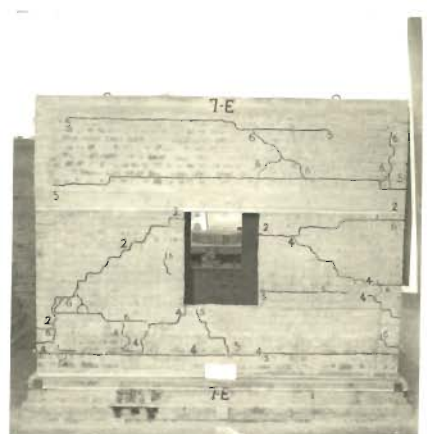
\_ MANY HORIZONTAL AND DIAGONAL CRACKS IN EAST CROSS-WALL DURING SHOCK NO. 5 ( MODEL 7 )
